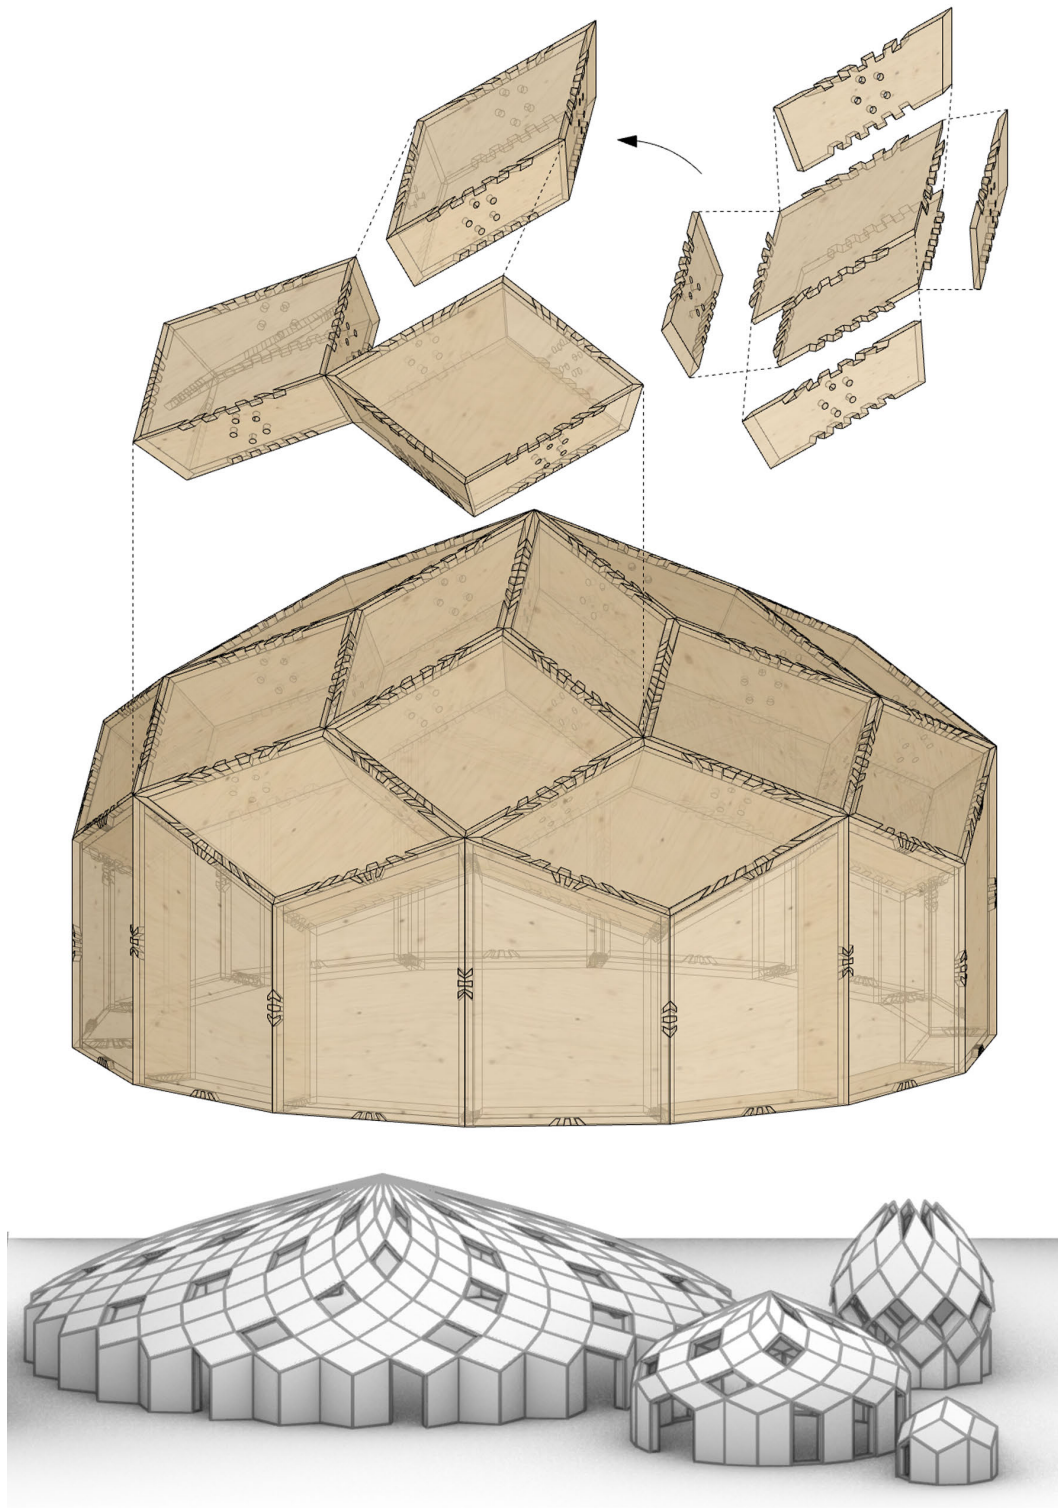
Using Manis to design zome structures (spiral-shaped domes).
